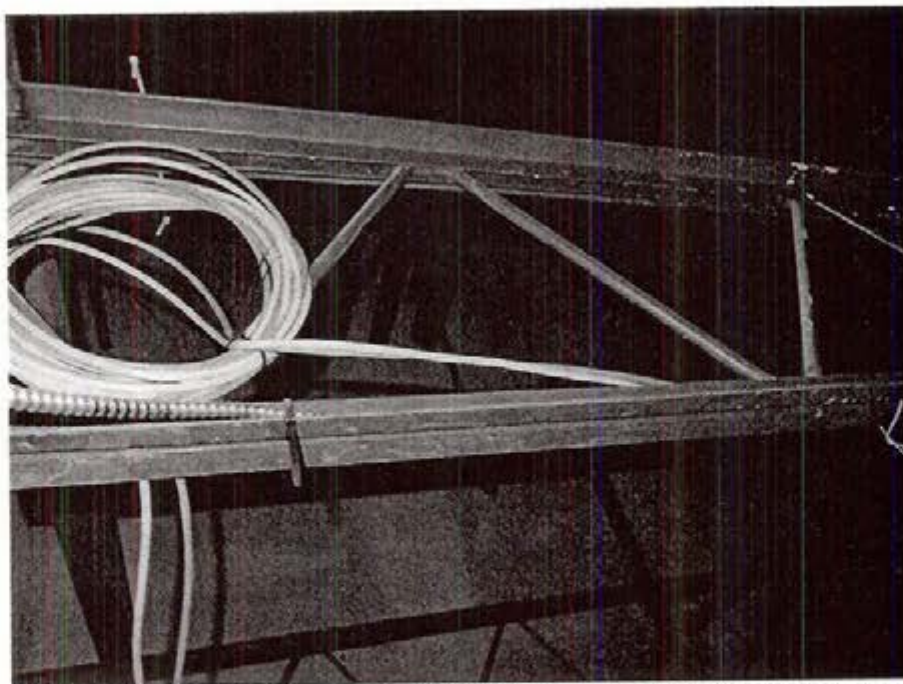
Lead wipe sample (042414-IFR-W-05) collected from a metal cable tray; above the drop ceiling of the west wall of the conference room.
